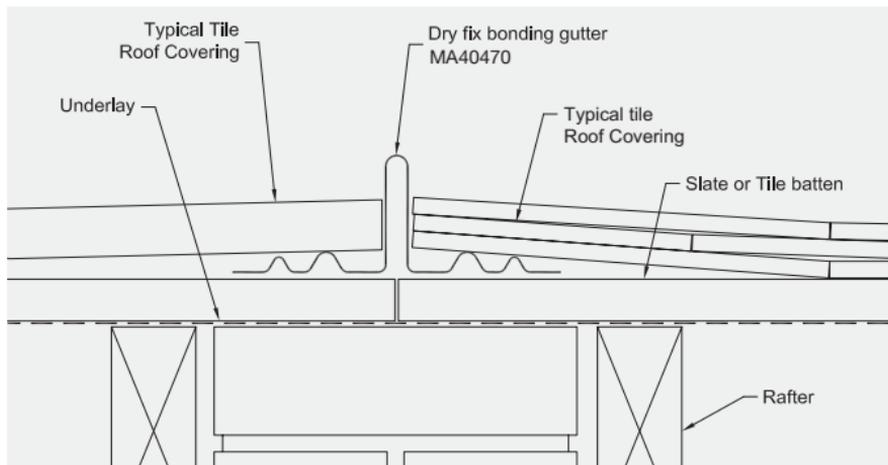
Typical standard installation showing low profiled interlocking tiles abutting slates, using MA40470
